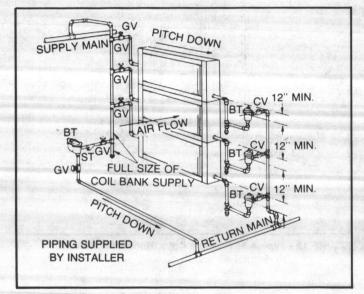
Type A Steam Colls, High Pressure, Horizontal Tubes for Horizontal Airflow
